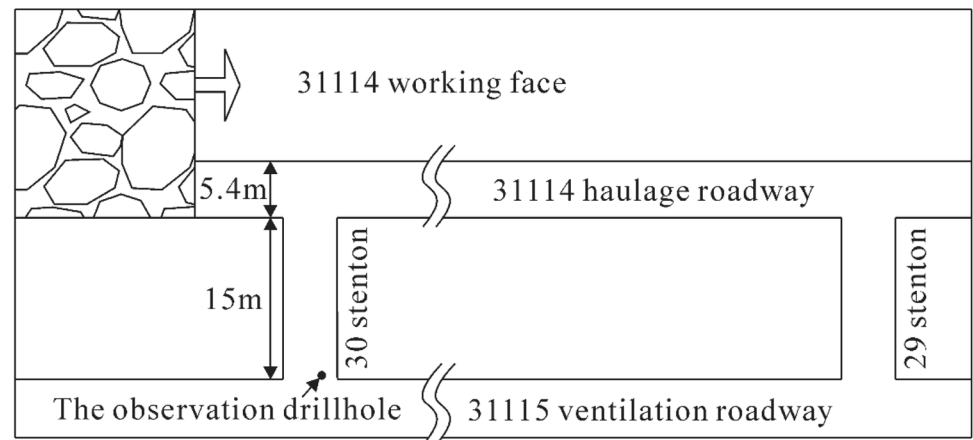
Layout of the 31,114 working face and the observation drill hole
